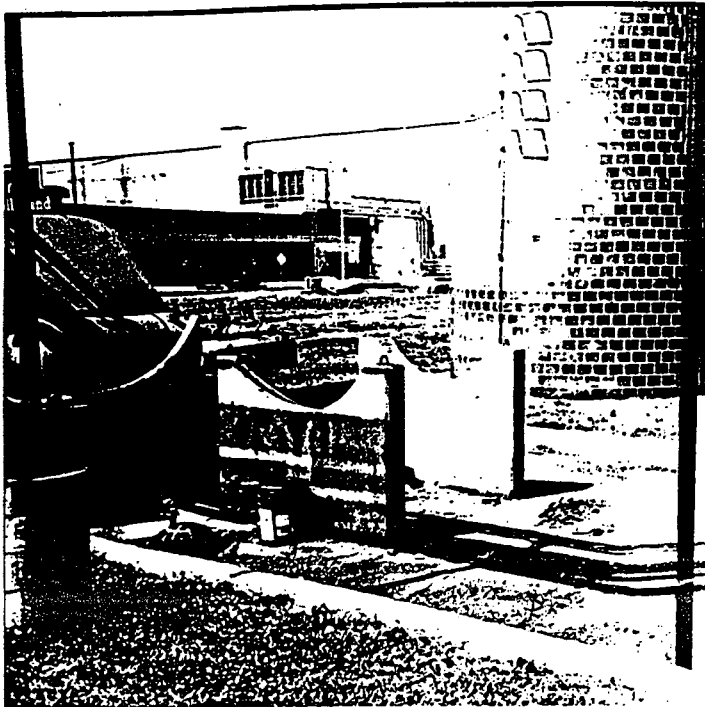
View, facing southeast, of former above ground waste oil tank area (SWMU 7) located adjacent to building TR-13. Tanks were taken out of service in the late 1970's. Note concrete containment.
